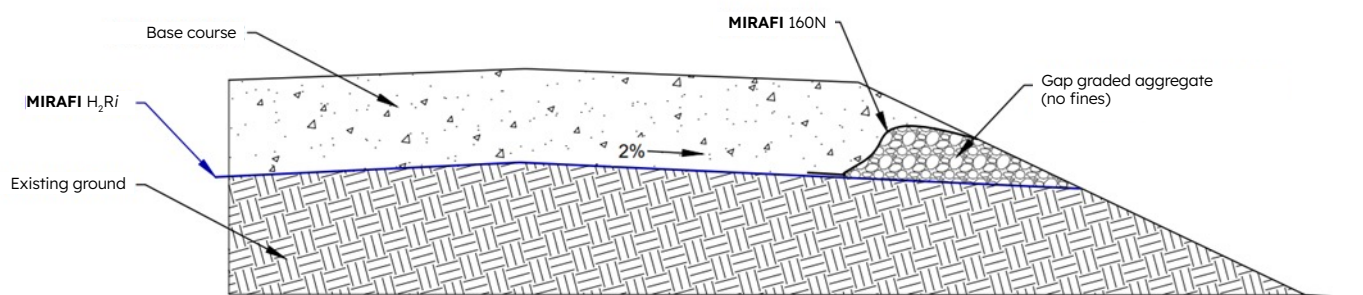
Embankment MIRAFI H₂Ri daylight to edge drain alternate detail
